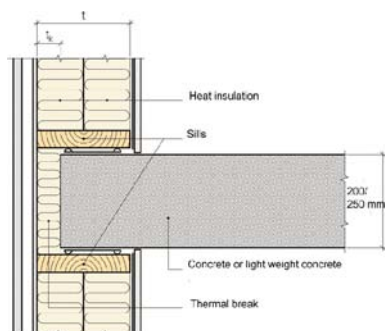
Detail of wall/floor junction, a typical point for thermal bridging
